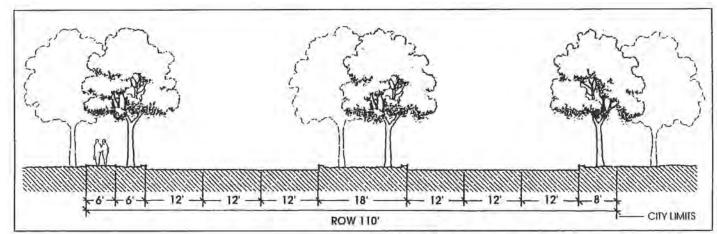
Typical section, Lone Tree Way west of Route 4 Bypass.
